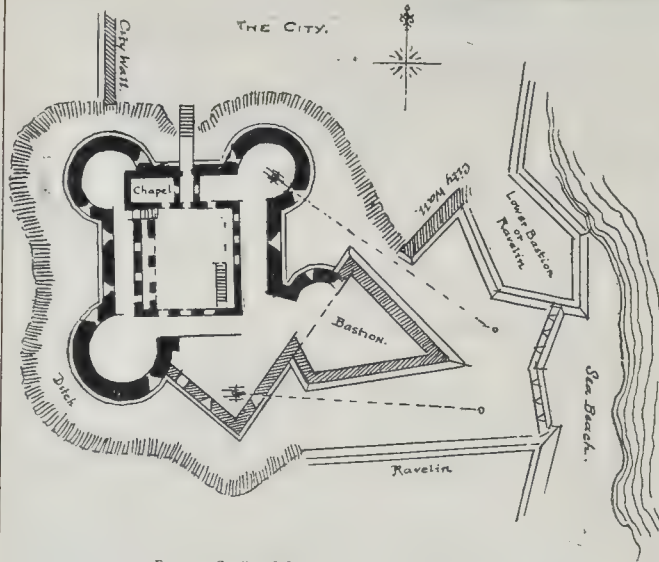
Castle of Otranto: Sketch Plan (no scale).
